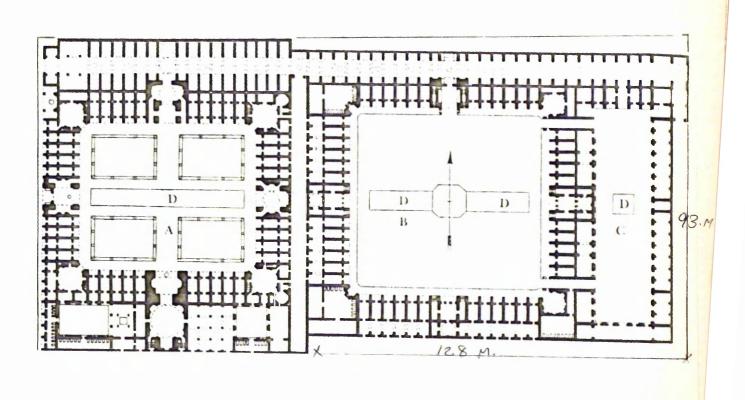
Plan of Caravansarai and Madrasah Madar-i-Shah
